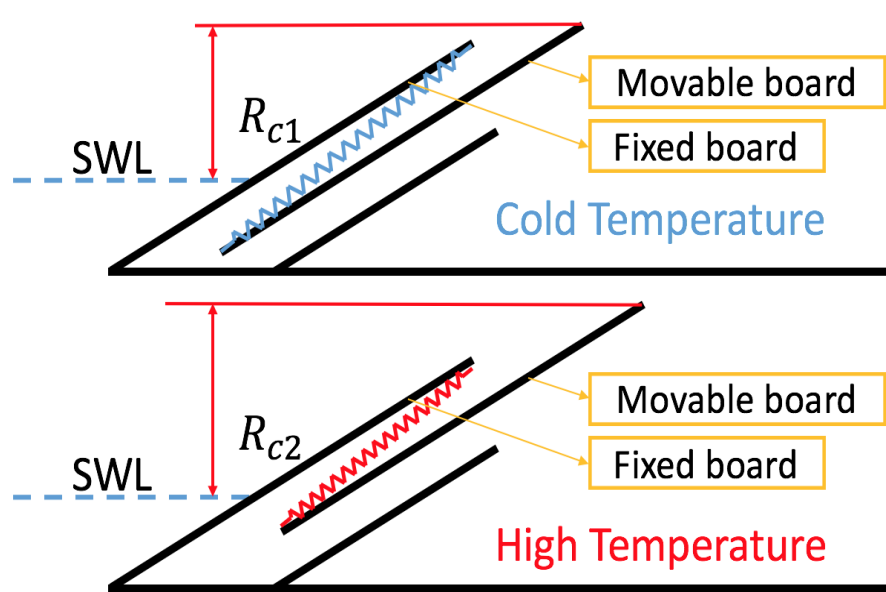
Concept of the Movable Board and the Fixed Board with SMA Springs
